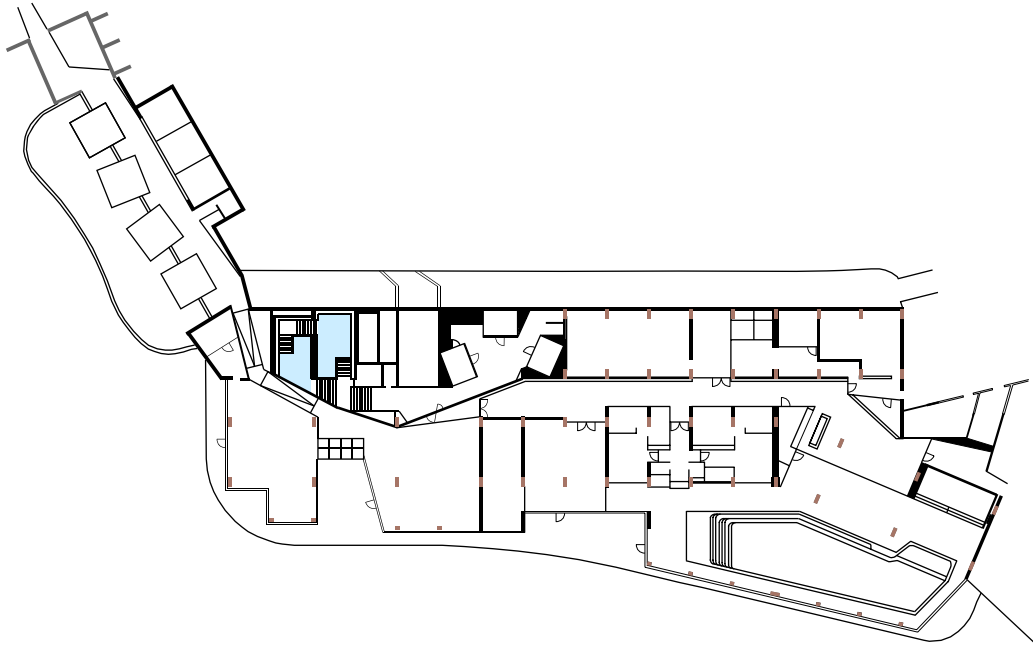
Spa Structural Plan (modified from Studio 92, 2018).
